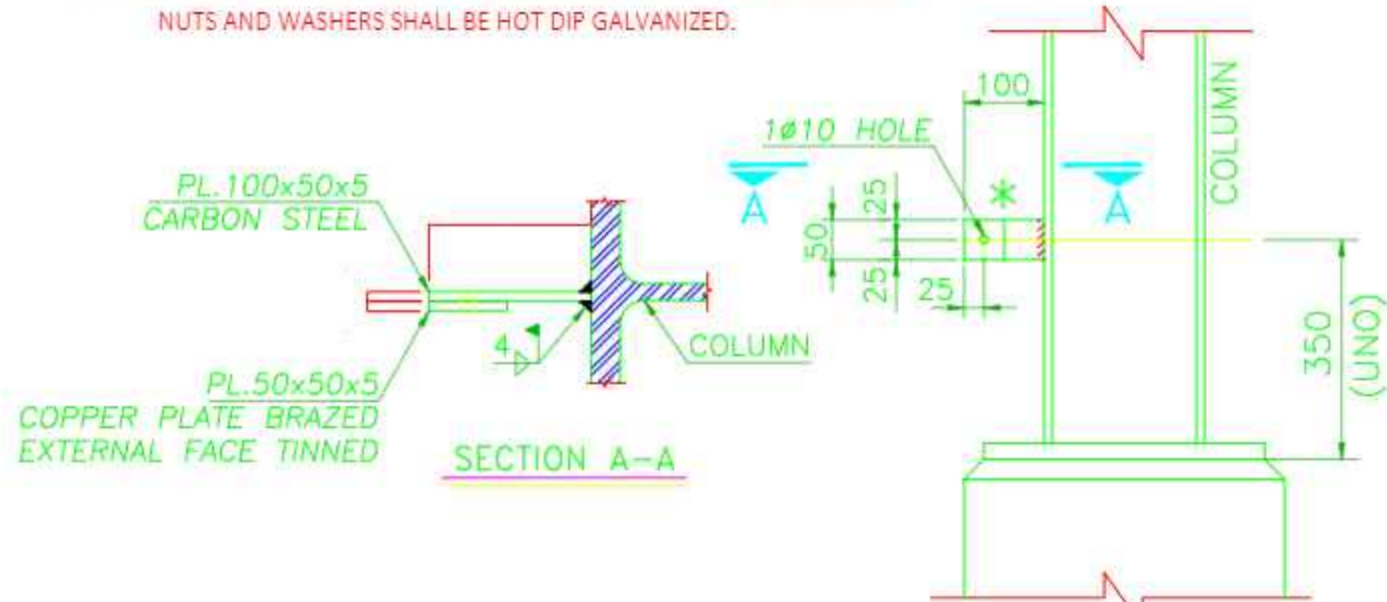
" -STEEL STRUCTURE EARTHING DETAILS
